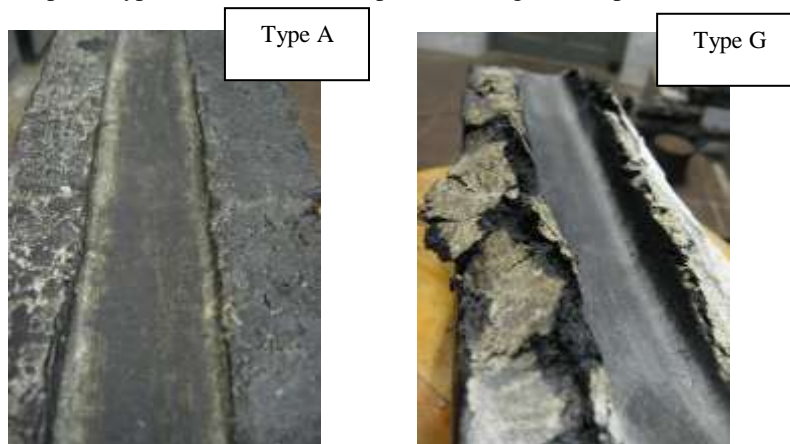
General view of asphalt concrete samples after 30,000 wheel passes (pure bitumen)
